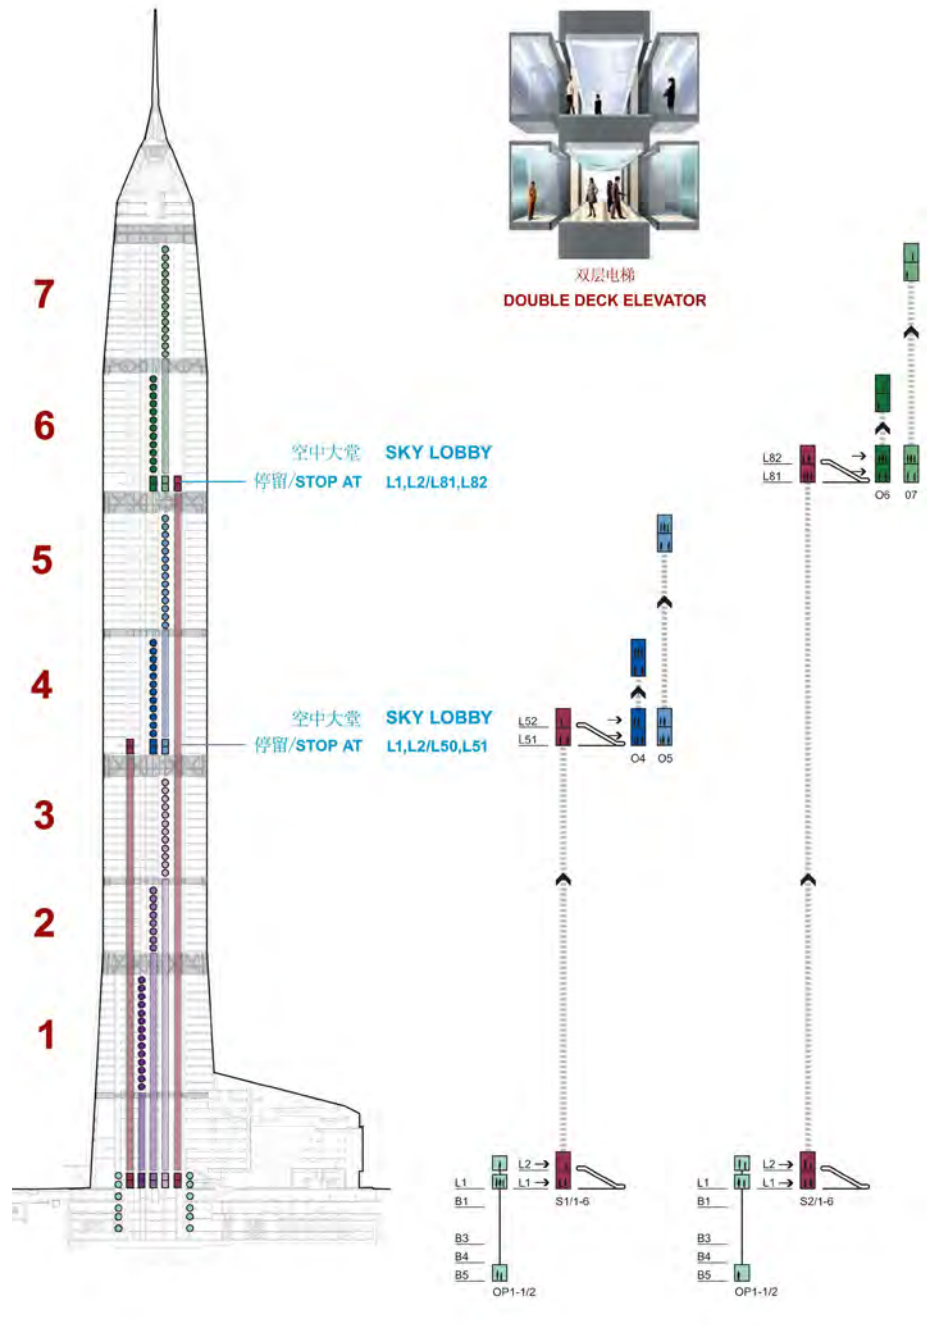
Elevator plan and the "sky lobby floors" (Source: Ping An)
